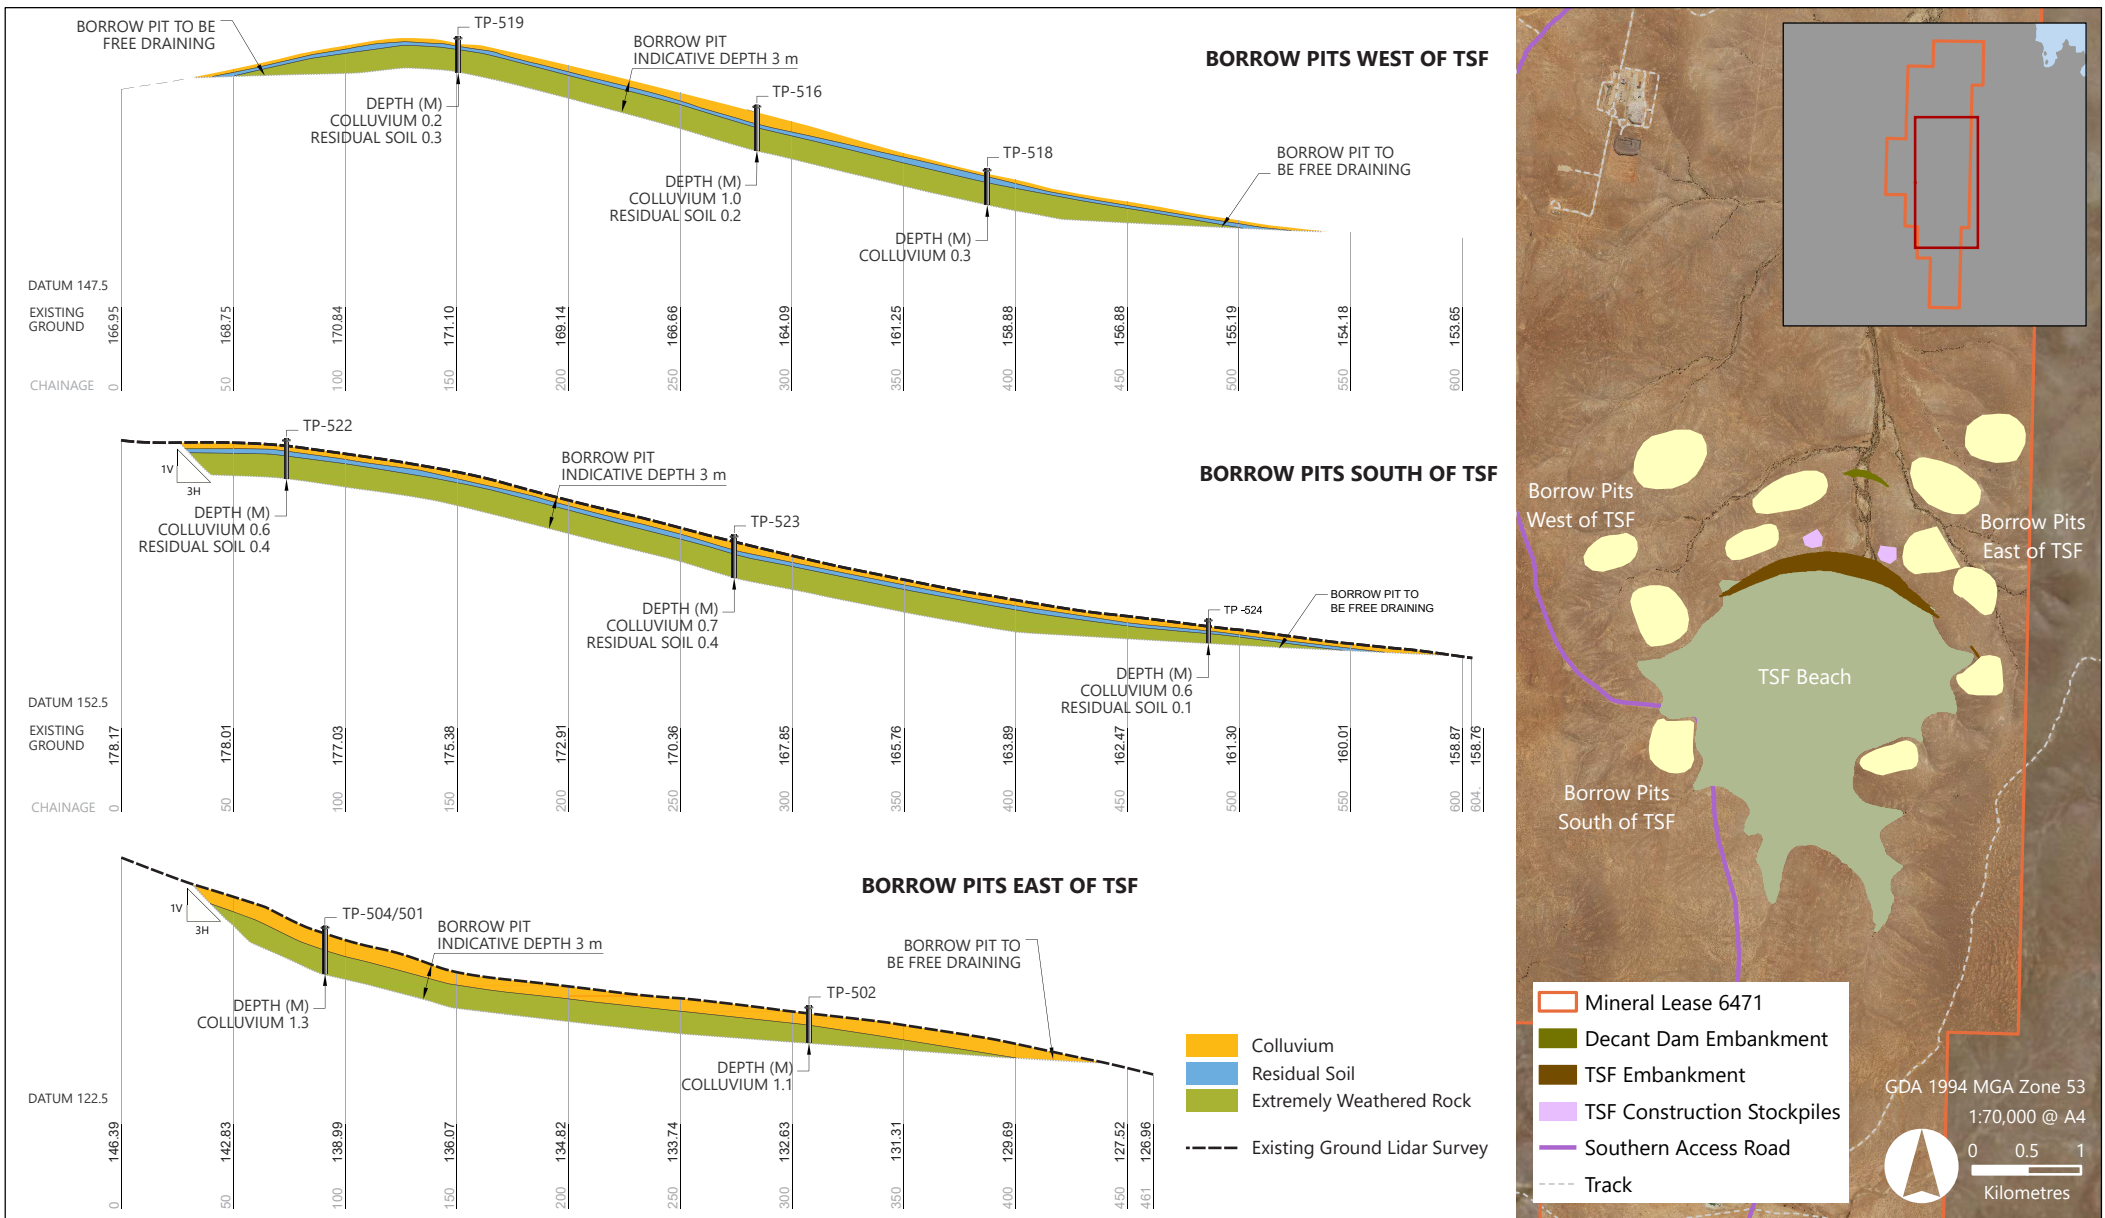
Tailings Storage Facility Borrow Pit Locations and Example Sections
